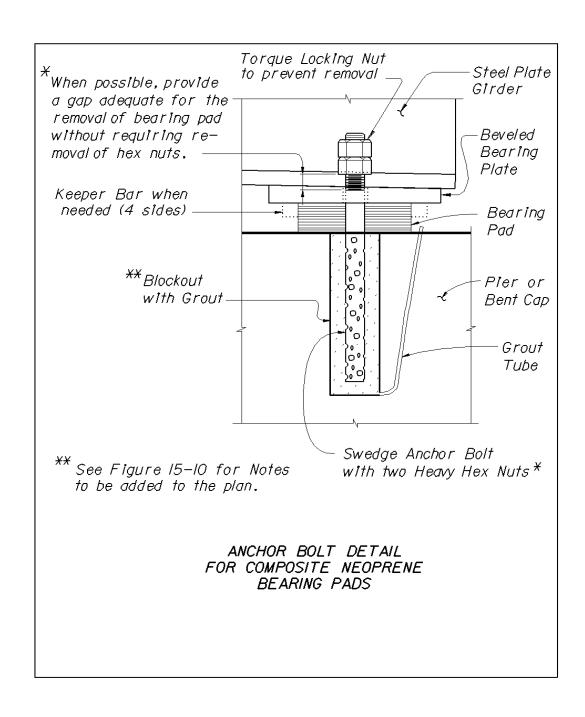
Anchor Bolt Detail for Composite Neoprene Bearing Pads
